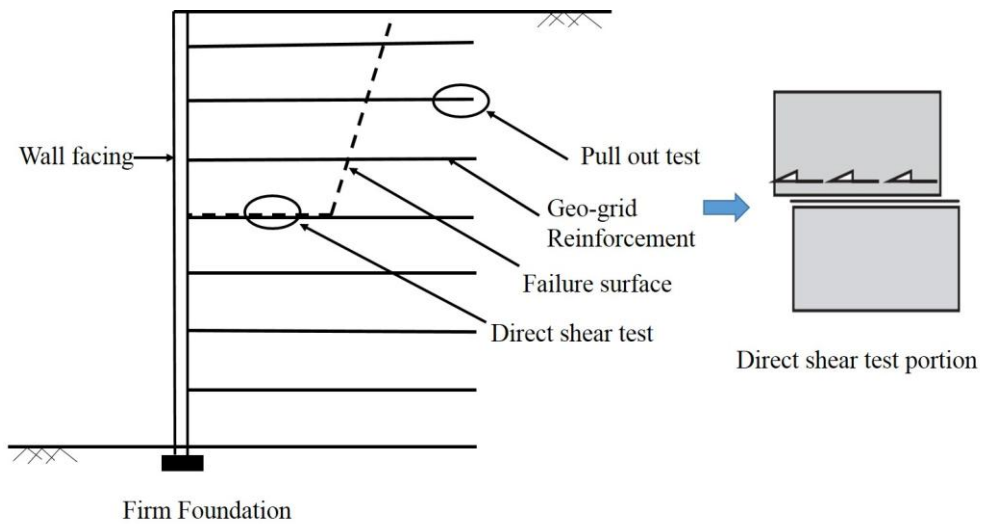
Schematic showing pull out and sliding failure modes (Palmeria 2009)
